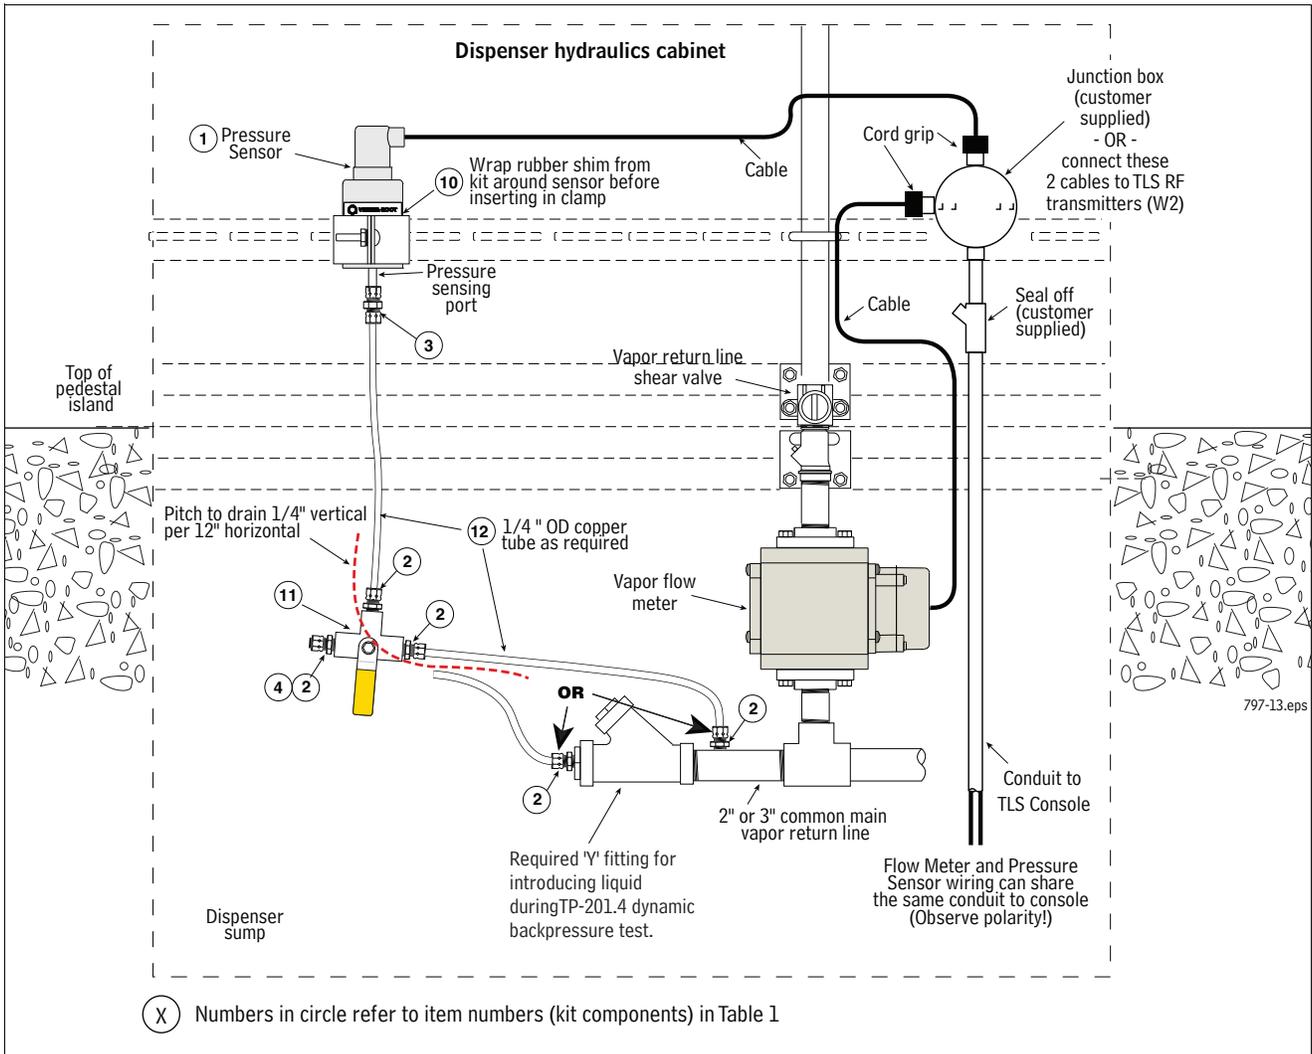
Example Pressure Sensor Install In Horizontal Access Fitting Or Vapor Return Line - ISD Installation (With Vapor Flow Meter Below Shear Valve)
